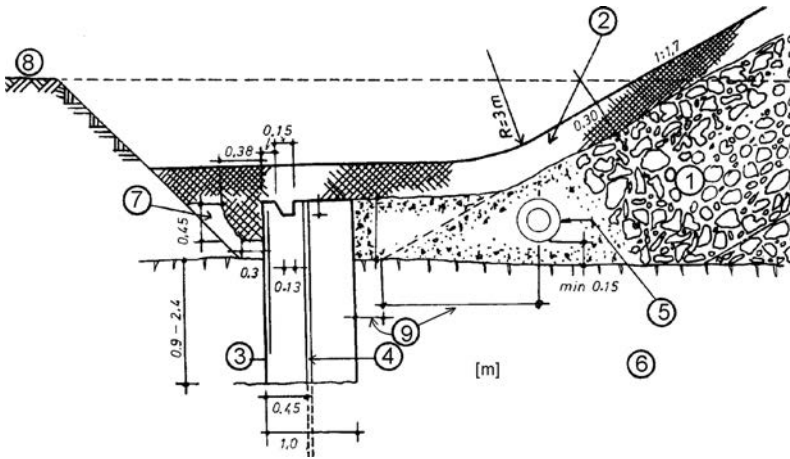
Joint of the facing and the concrete foundation at Montgomery dam, USA (after USBR, 1977b). (1) Drainage layer of tipped rock; (2) asphaltic concrete lining; (3) concrete cutoff; (4) grouting pipe; (5) drainage pipe; (6) rock; (7) filling; (8) ground; (9) variable distance.
